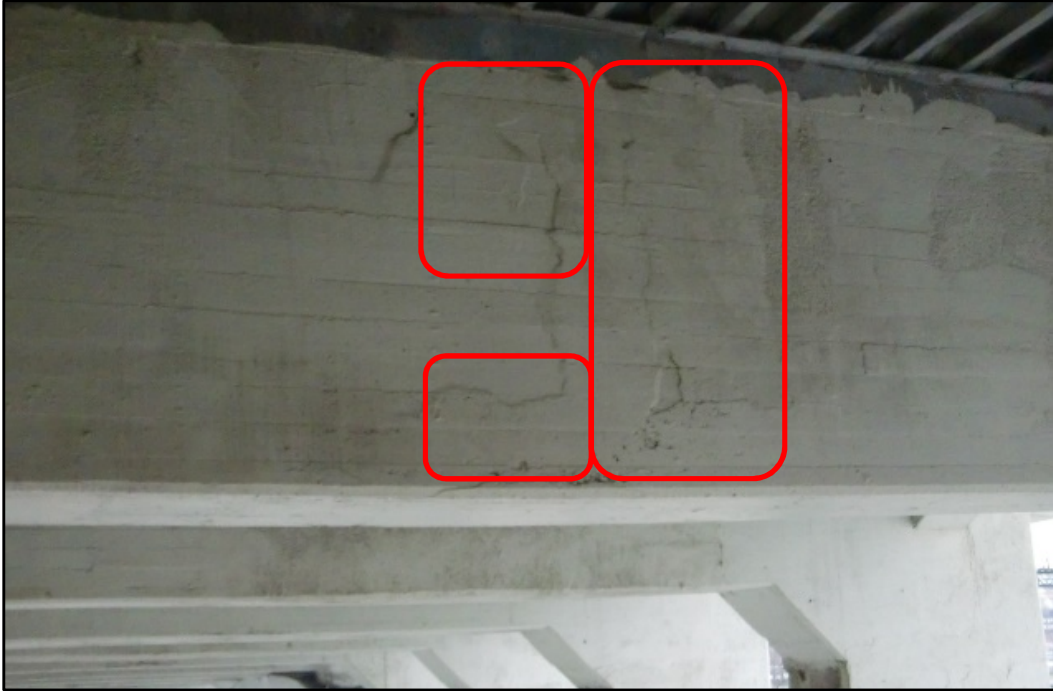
Newly Developing Lower Deck Floor Beam Delaminations (Circled), South Bay, Span 8.
